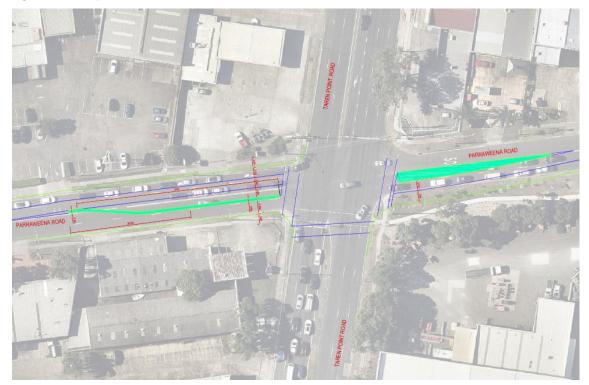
Proposed Taren Point Road/Parraweena Road Intersection
